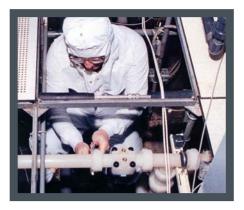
Mechanically joined "Sanitary" PVDF piping system
